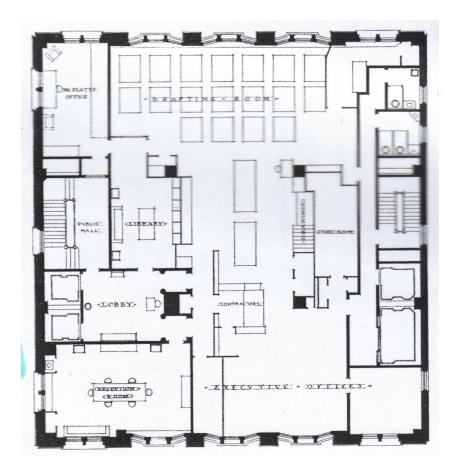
Office Plan of Charles A. Platt, New York architect. xvii
